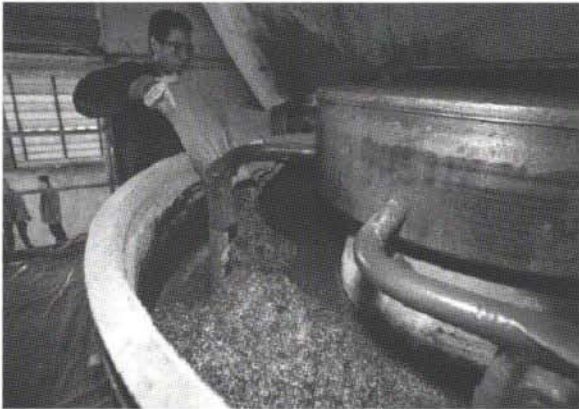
Fabrication of the UHPFRC (adding of the steel fibres) in a standard mixer, at the ready mix plant (Photo A. Herzog).
